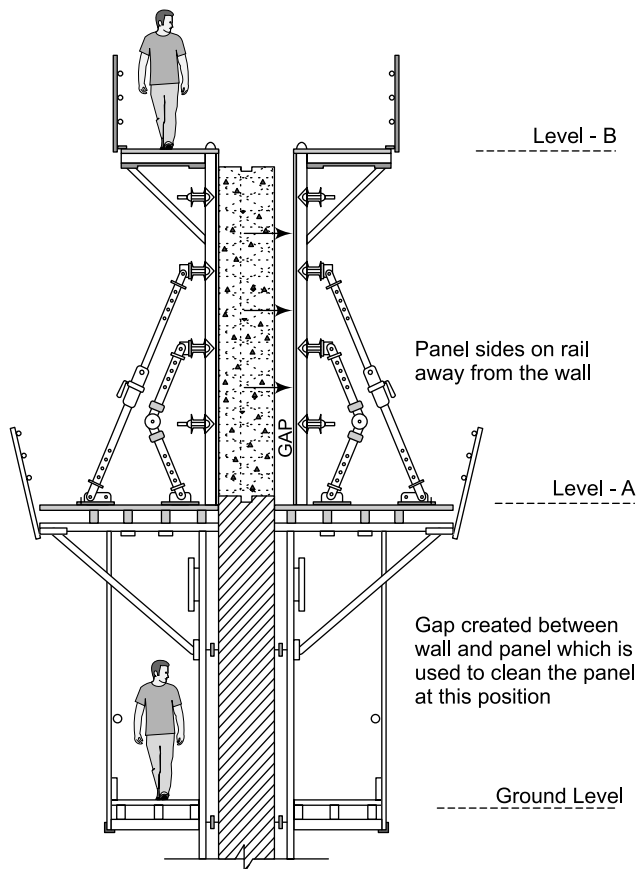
(b) View Showing the Gap Between the Concrete and Wall Form (Rolling Type).
